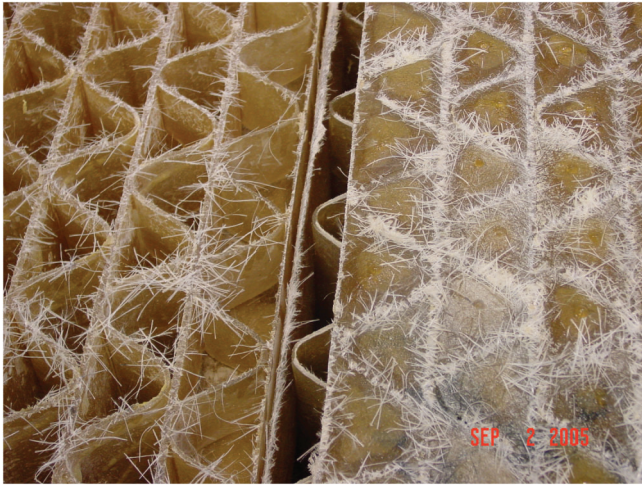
View of Longitudinal Joint; Top Plate Removed – KSCI #P1a Test
